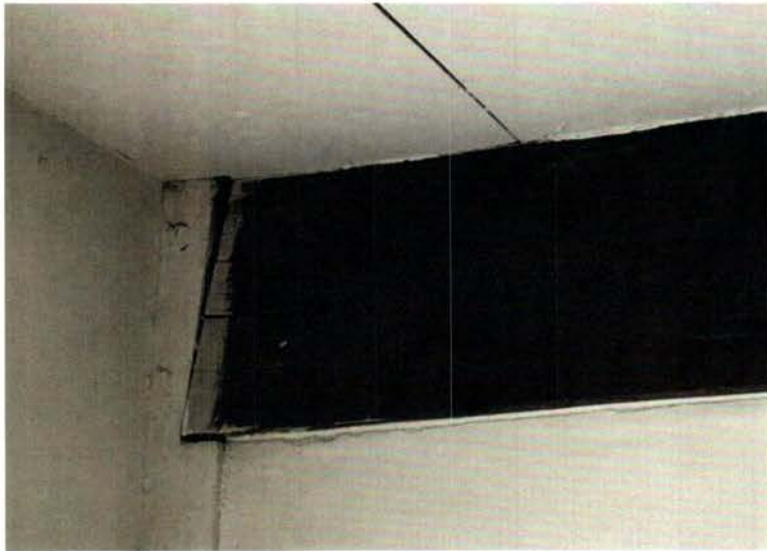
Office (Room 102) looking NW at a location where the upright post (painted white) is shouldered to allow the beam (dark stained) to sit. This view also shows the pegging of the tenon at the beam. This location is the west end of anchor-bent A4.
